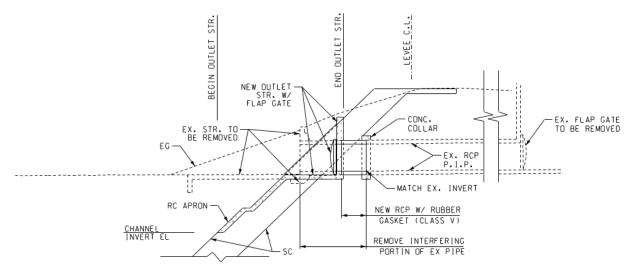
Typical Storm Drain Modification (Side Drain Nos. 4 and 6)
